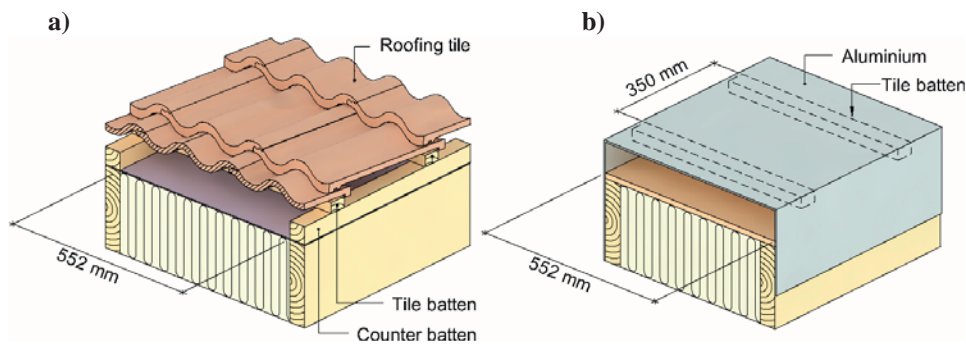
a) Cross-section of a typical Type B roof structure with roofing tiles. b) A cross-section of the test model consisting of an aluminium box corresponding to the air gap between two counter battens with a width of 48 mm and a centre-to-centre distance of 600 mm. The centre to centre distance of the tile battens is 350 mm.
